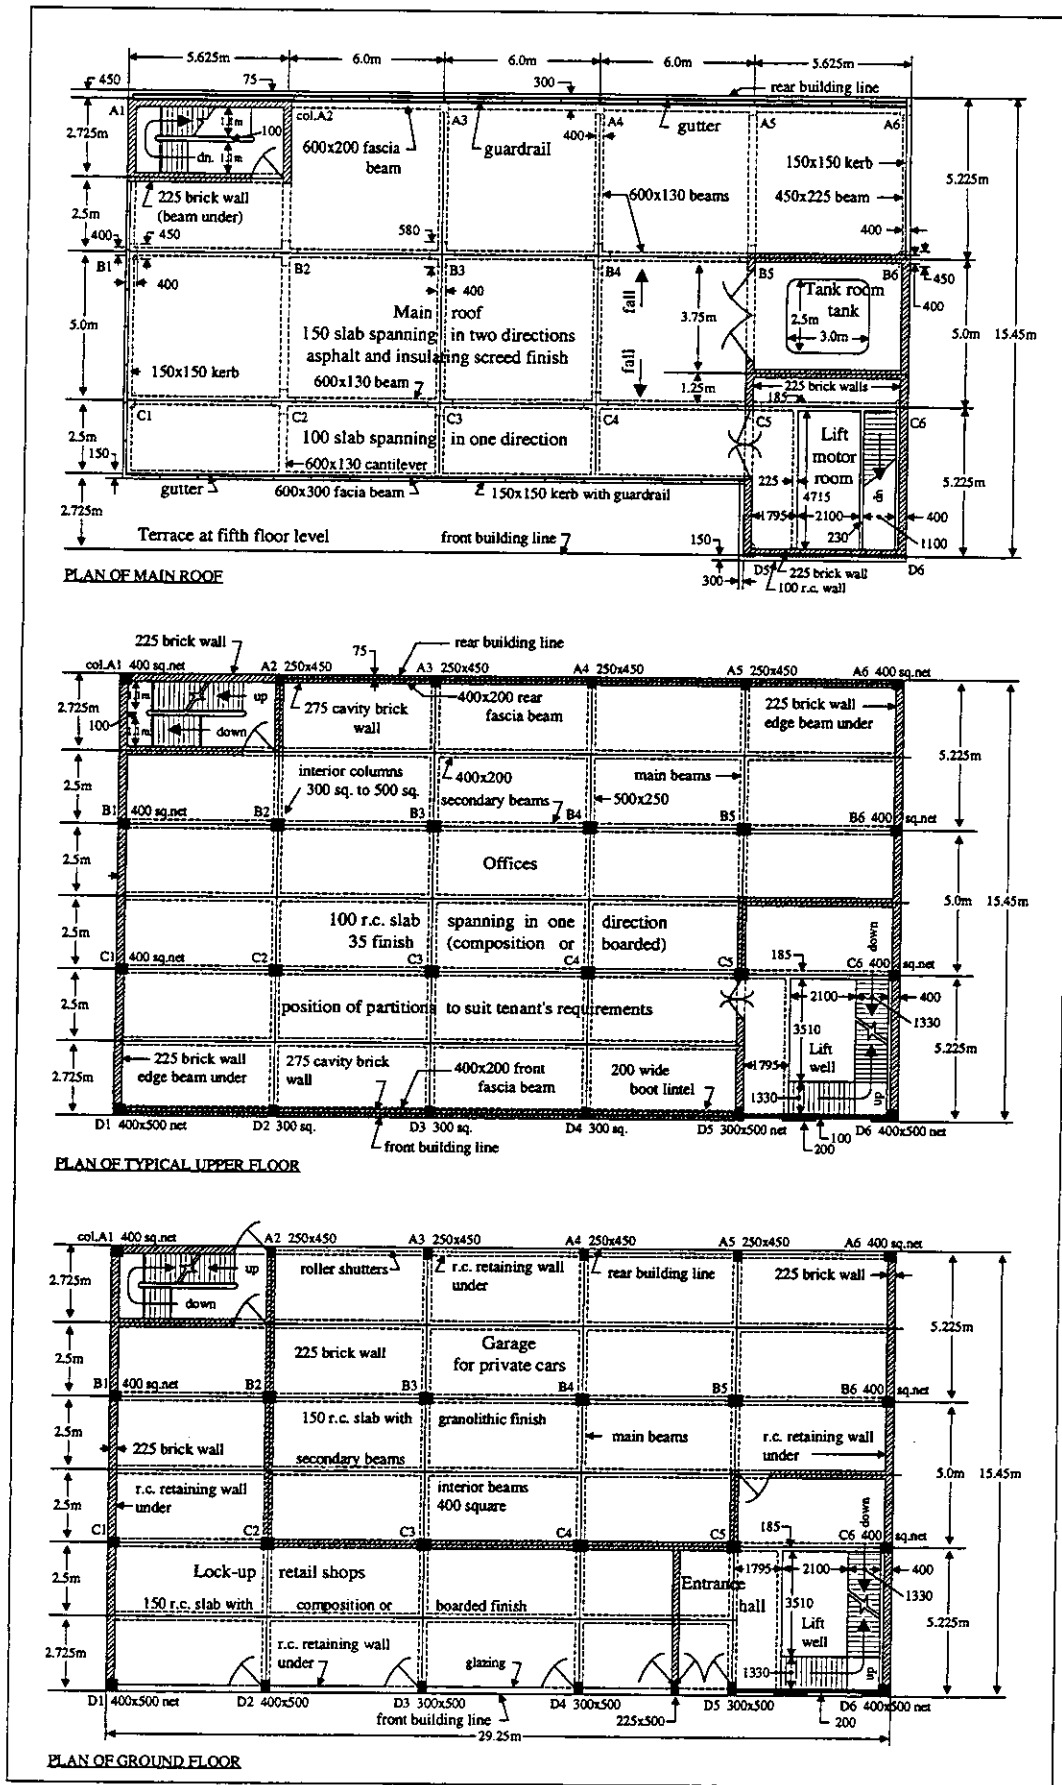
Concrete Framed Building Dimensions - Moment Resisting Frame: General Arrangement - Plans
